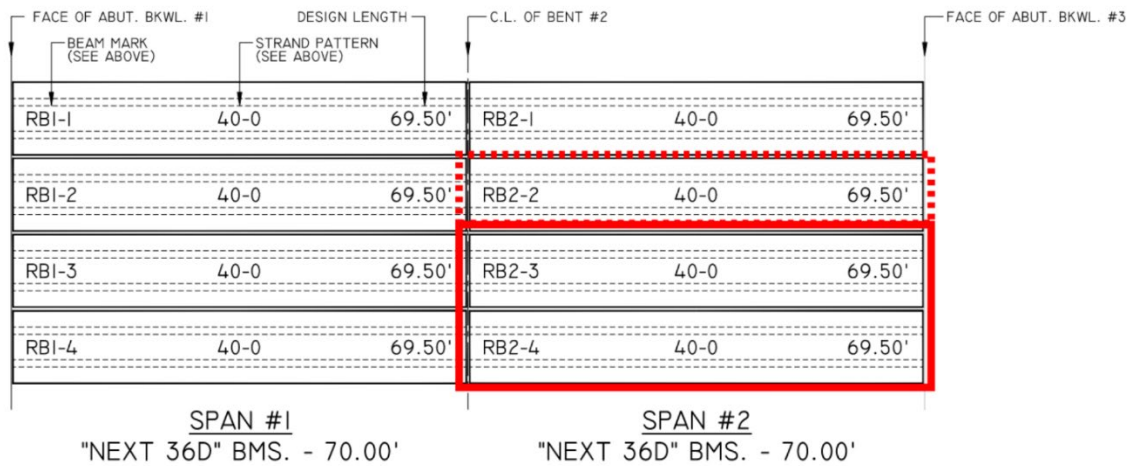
Plan View of NEXT Beam Section RB2-2
